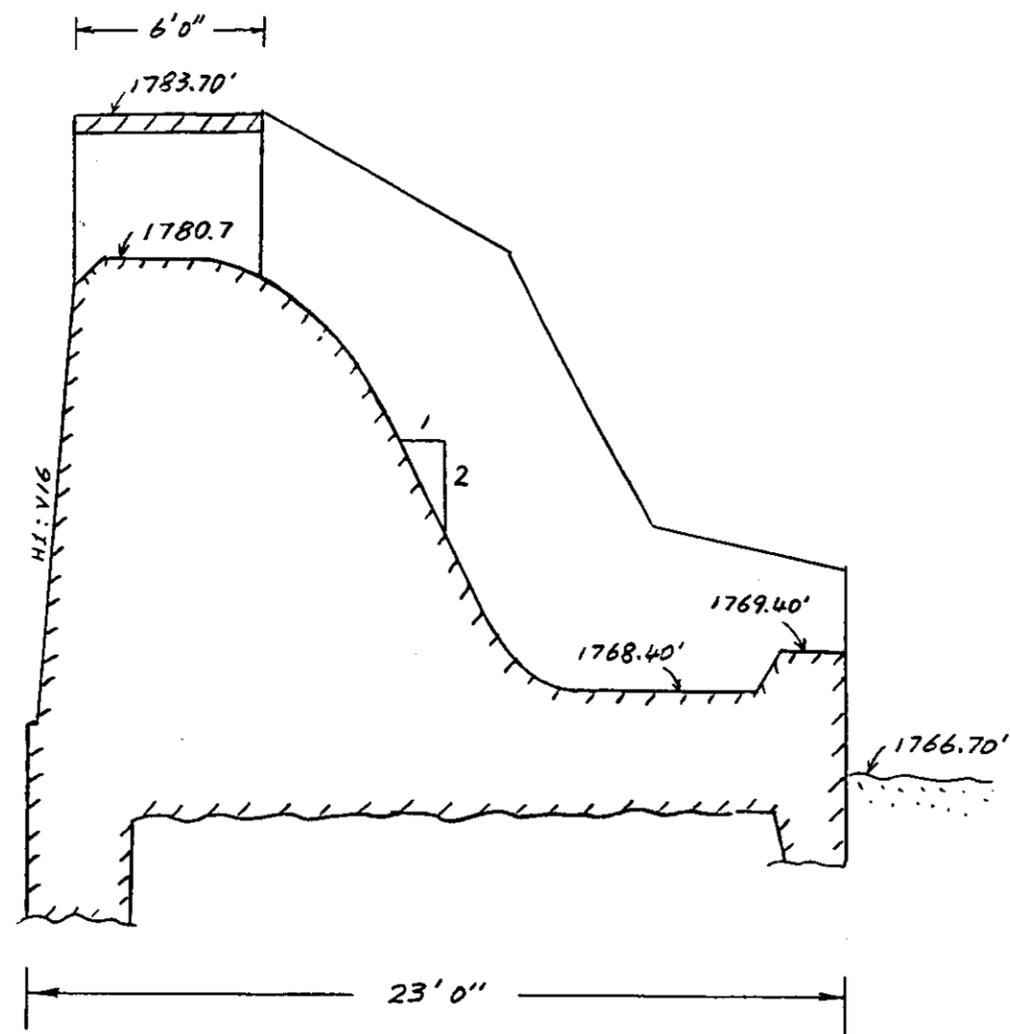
Plans of Noyes Pond and Dam Appurtenances.
